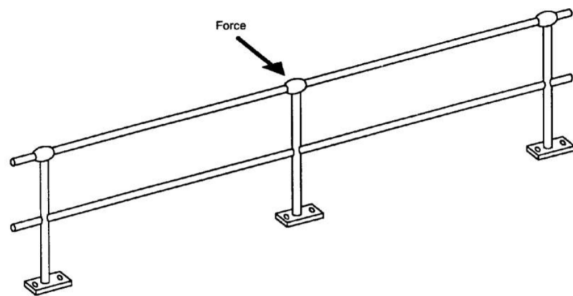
TYPICAL GUARDRAIL POST TEST
